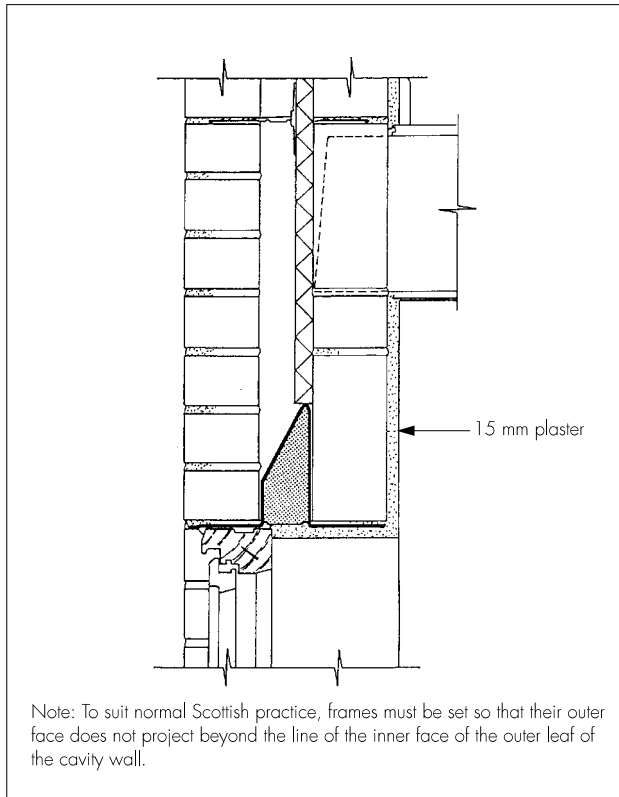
Typical installation details for Cougar closed eaves lintels (types CGE)
